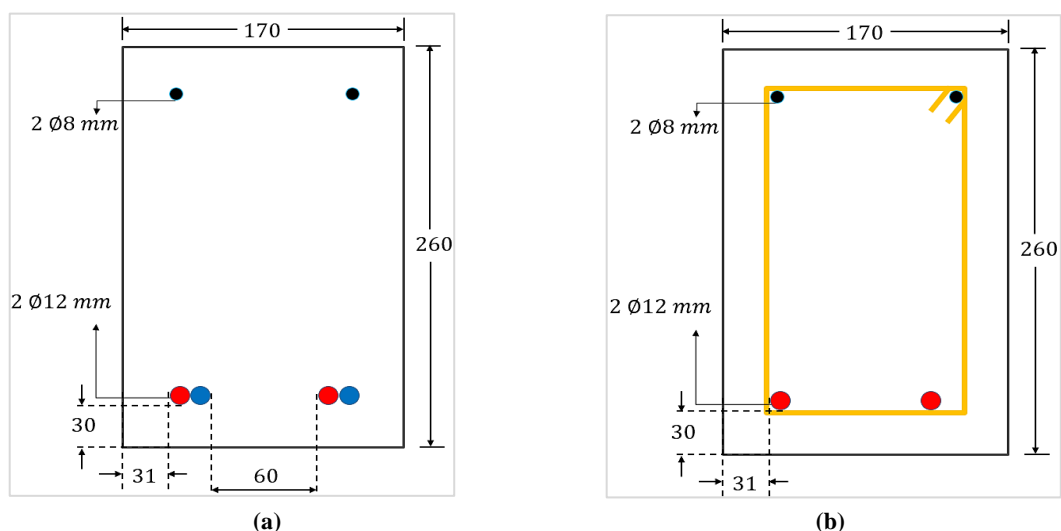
Cross sections of beams of groups two, group three, and group four (a) Cross-section A – A (b) Cross-section B – B
